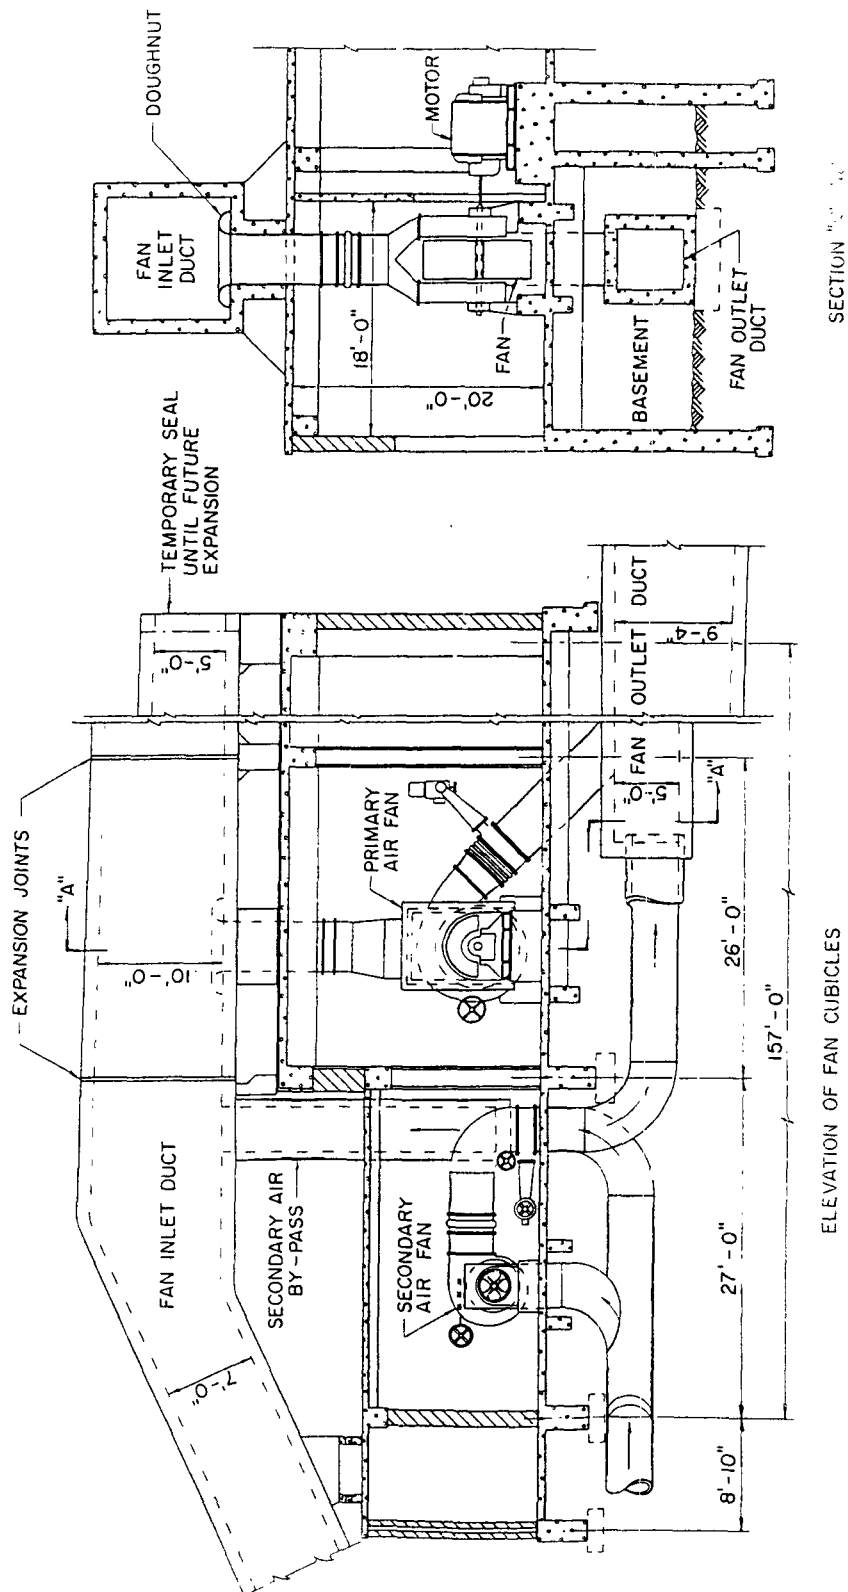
Fan House Section Showing Primary Air Fan, Building 704
